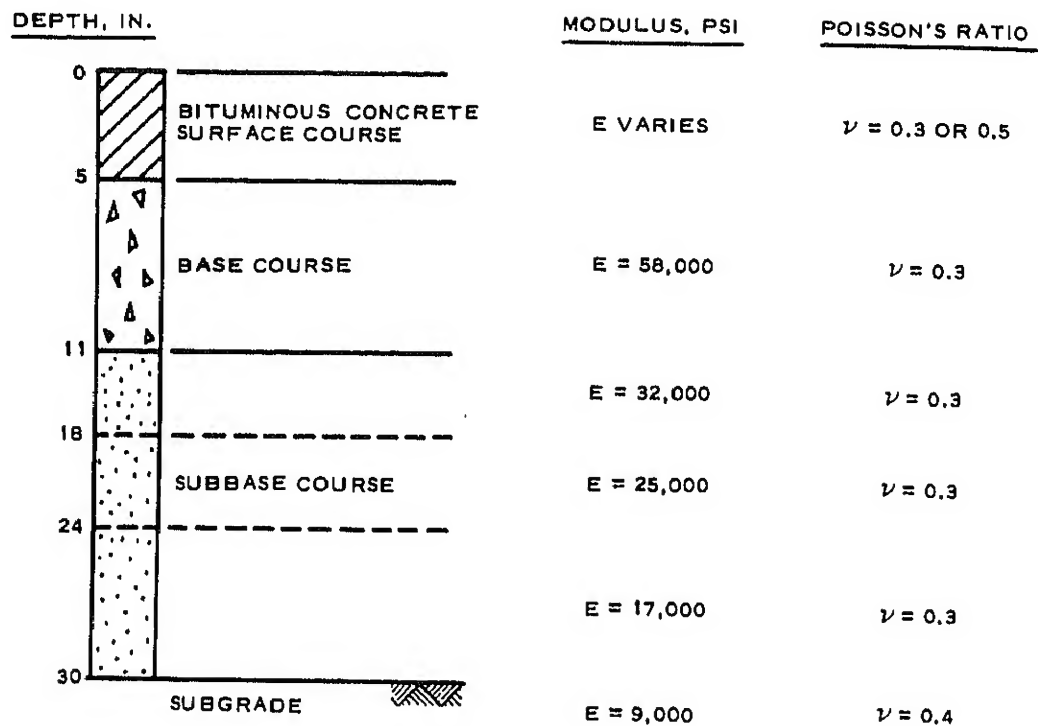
Section for pavement thickness of 30 inches for initial taxiway design.
